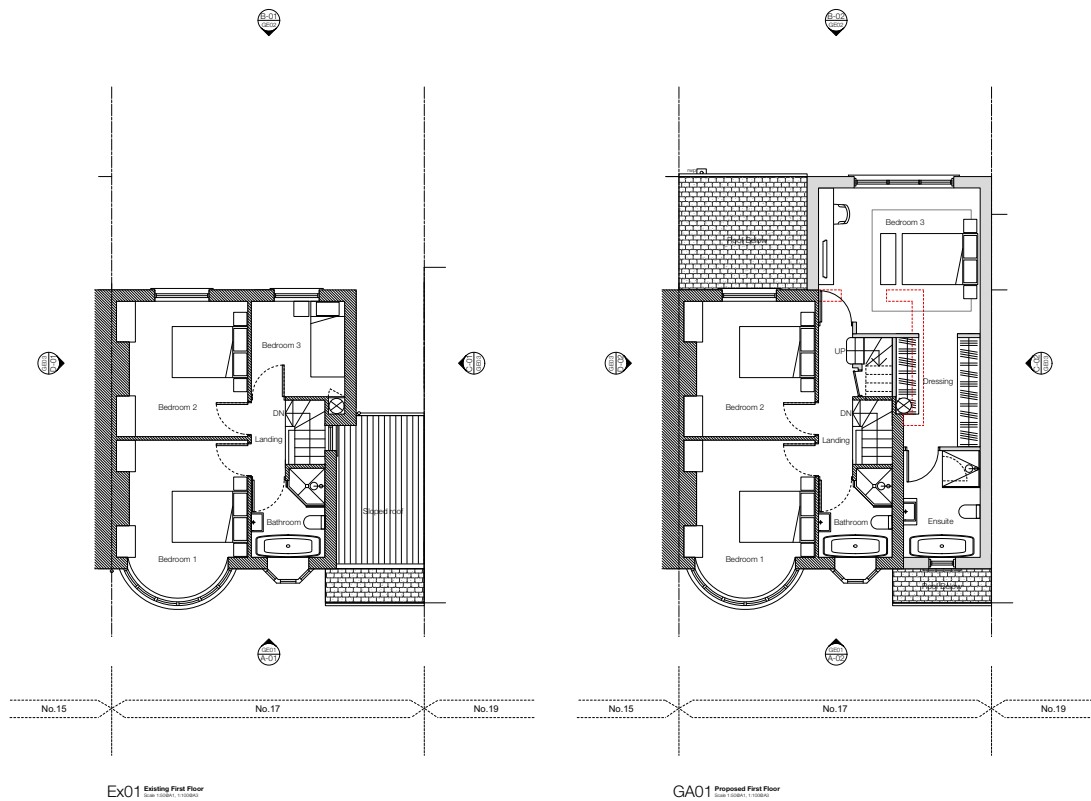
Existing and Proposed First Floor Plans (not to scale)
